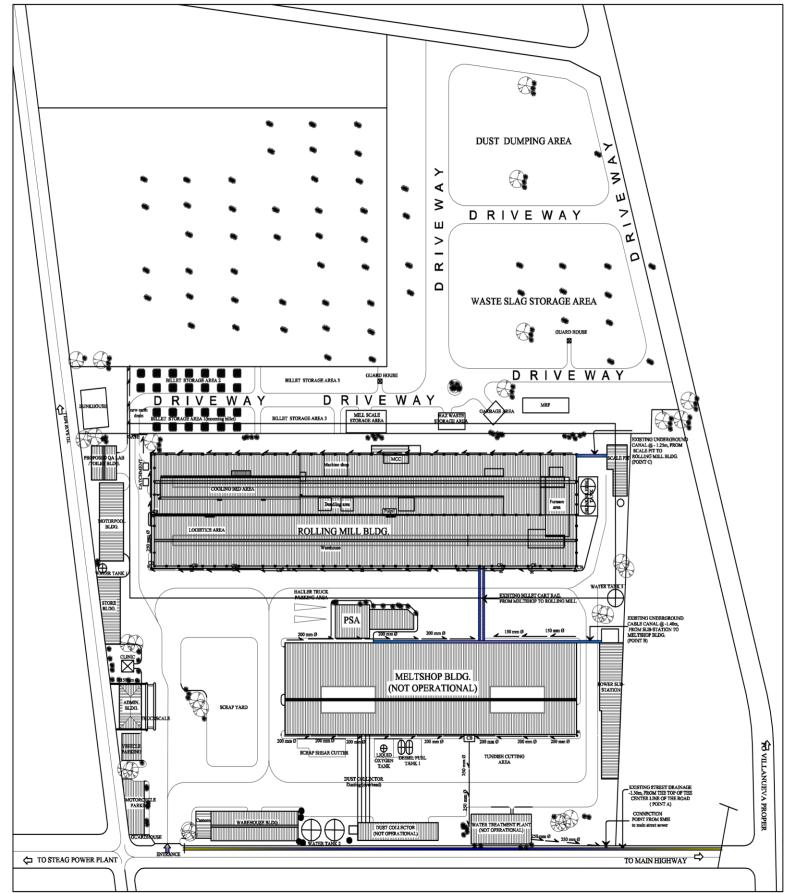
4.1.1: Project Lay-out / Site Development Plan
